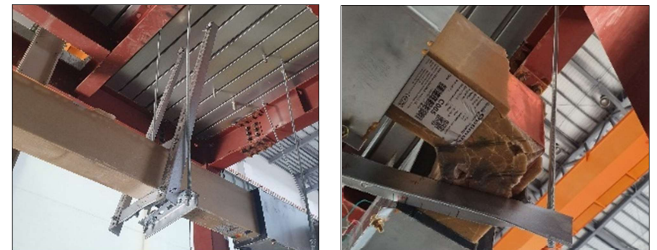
(a) Failure of braced frames; (b) cracked corner elbow of cast resin busway
